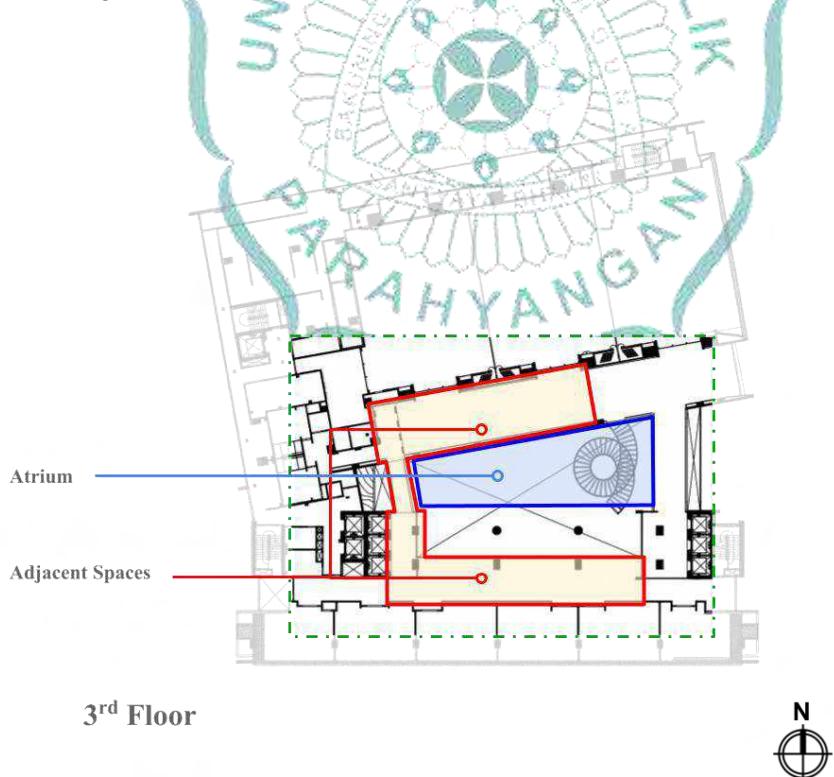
Scope of atrium and adjacent spaces in case study (3rd floor plan)
